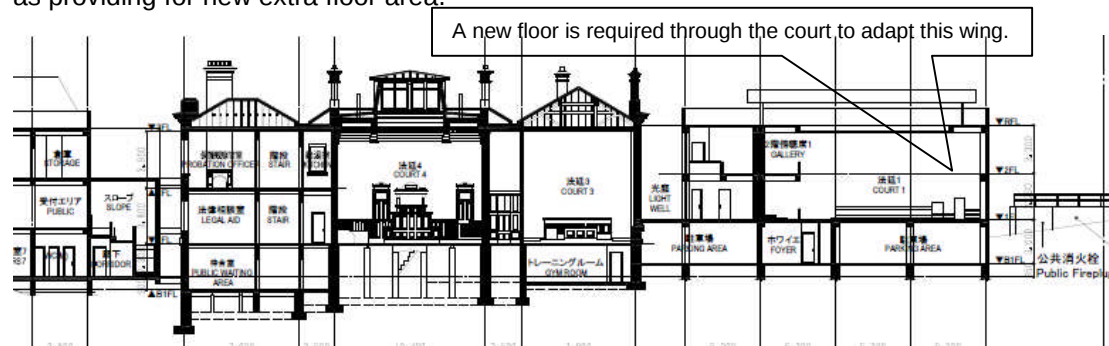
Section through the existing Newcastle Courthouse showing the volumes. (Azusa Sekkei Architects)
